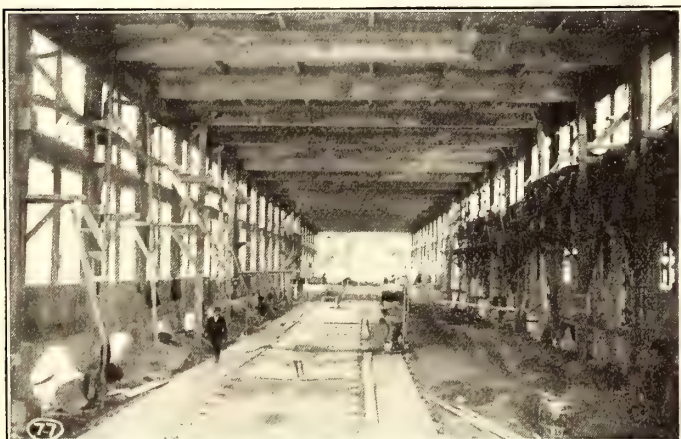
INTERIOR VIEW OF SHOP, SHOWING SCAFFOLDING FOR FILLING IN WINDOW SPACES. LAYING CONCRETE FLOOR TO PITS
